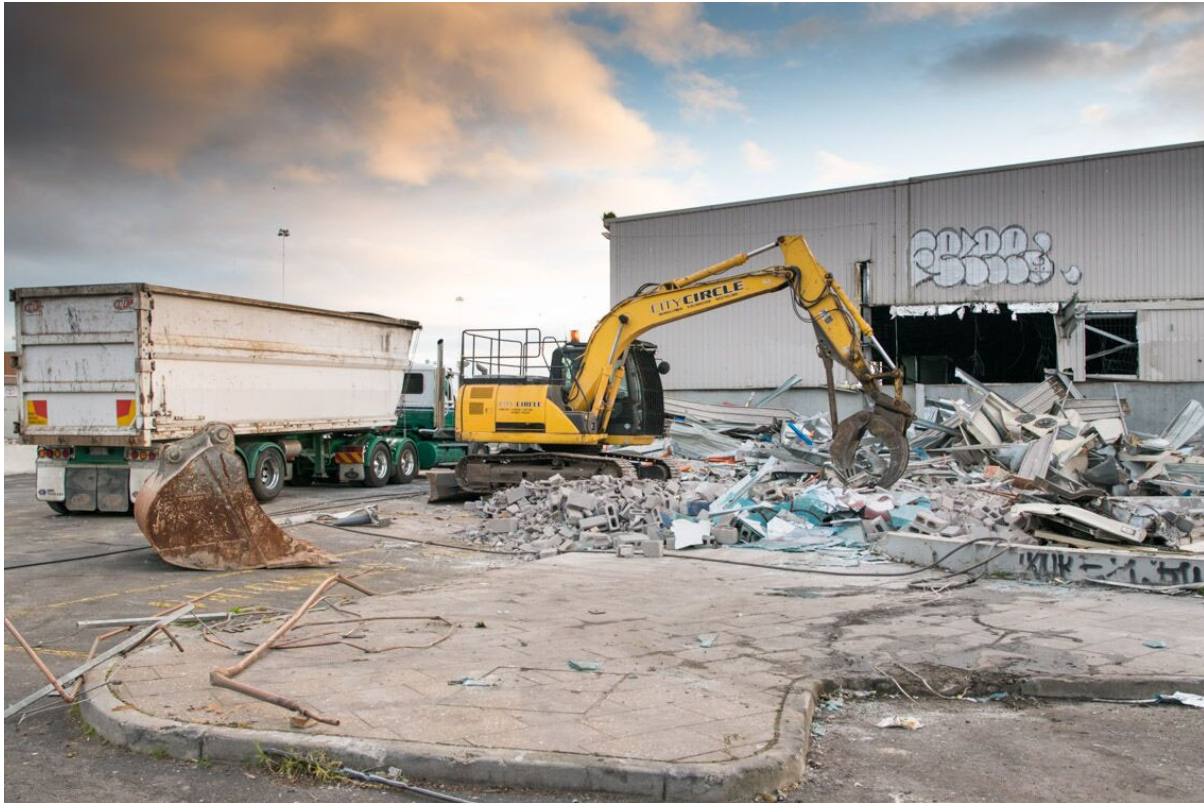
Melbourne market demolition – East (Source: WGTA)
